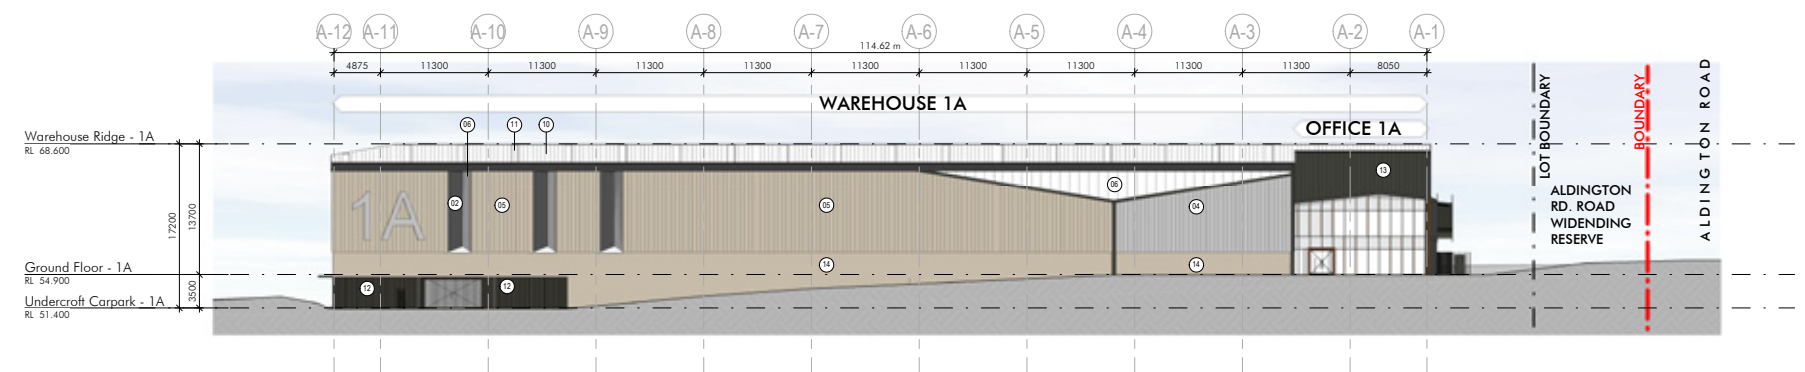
Warehouse 1A – South Elevation (Access Road, Frontage)
